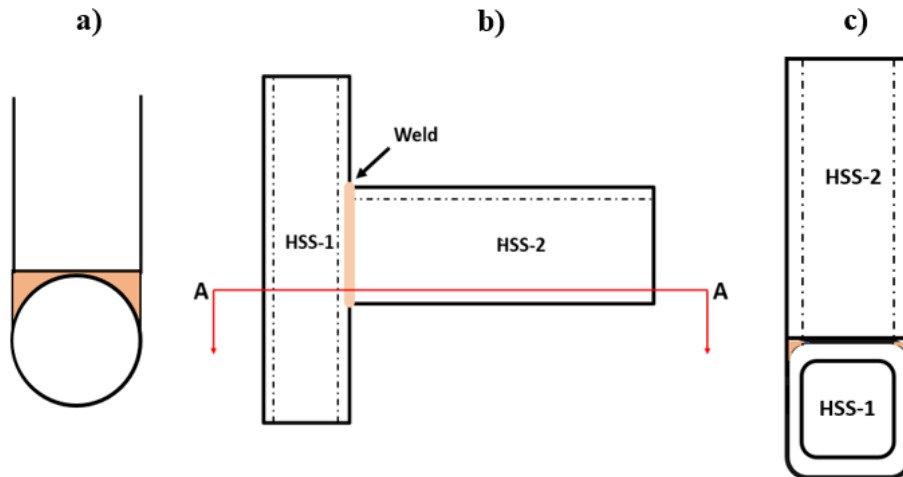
a) Typical FBG Weld. b) FBG weld for two HSS members, c) Cross section view of welded HSS.
